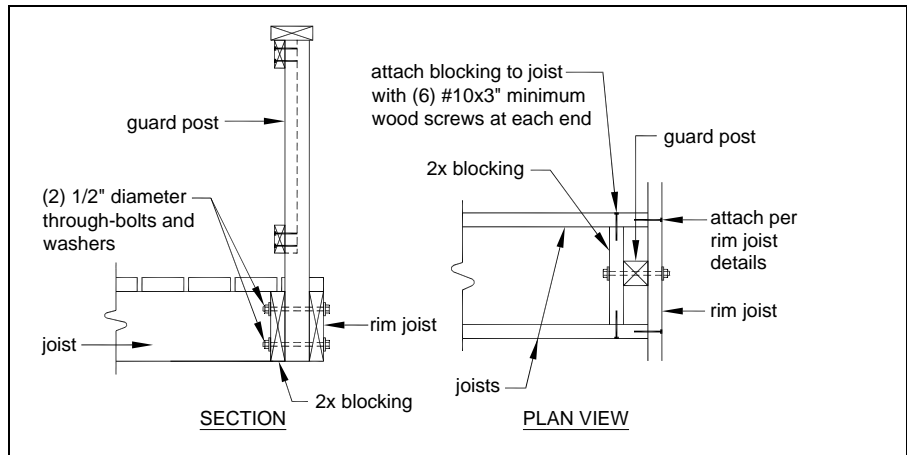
GUARD POST TO RIM JOIST DETAIL, OPTION 1
